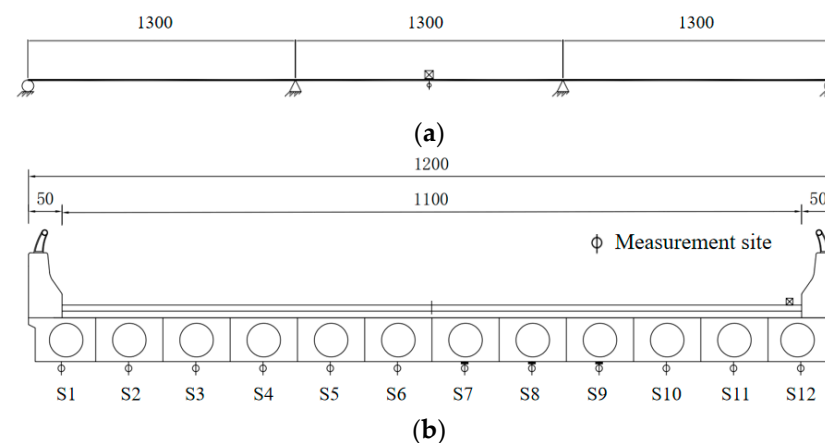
Geometry of the case bridge (in cm). (a) Longitudinal geometry of the case bridge; (b) cross-section geometry of the case bridge.
